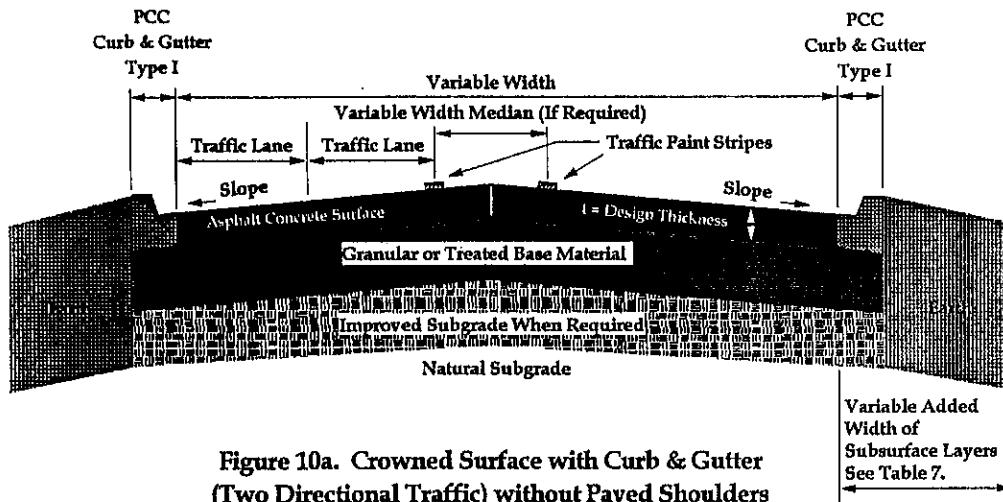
Crowned surface with curb & gutter (two directional traffic).
